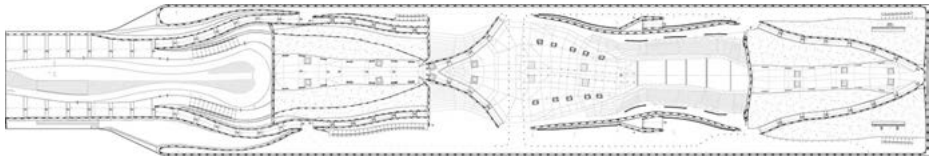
Roof Plan Yokohama Ferry Terminal (courtesy Foreign Office Architects)
